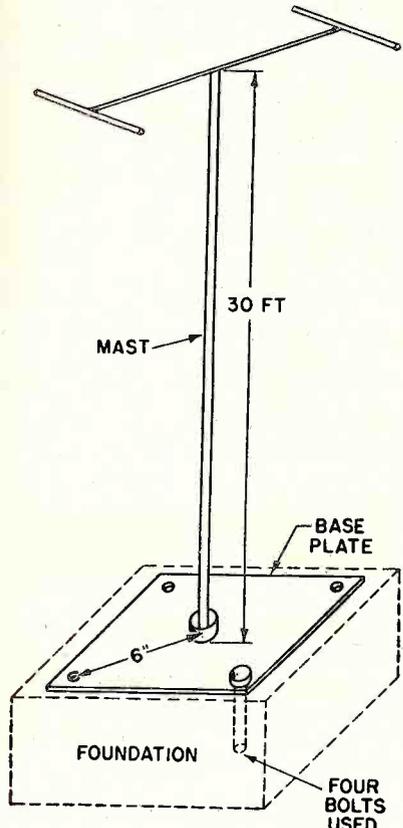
Thirty-foot tower supported by four bolts fastened to foundation.
